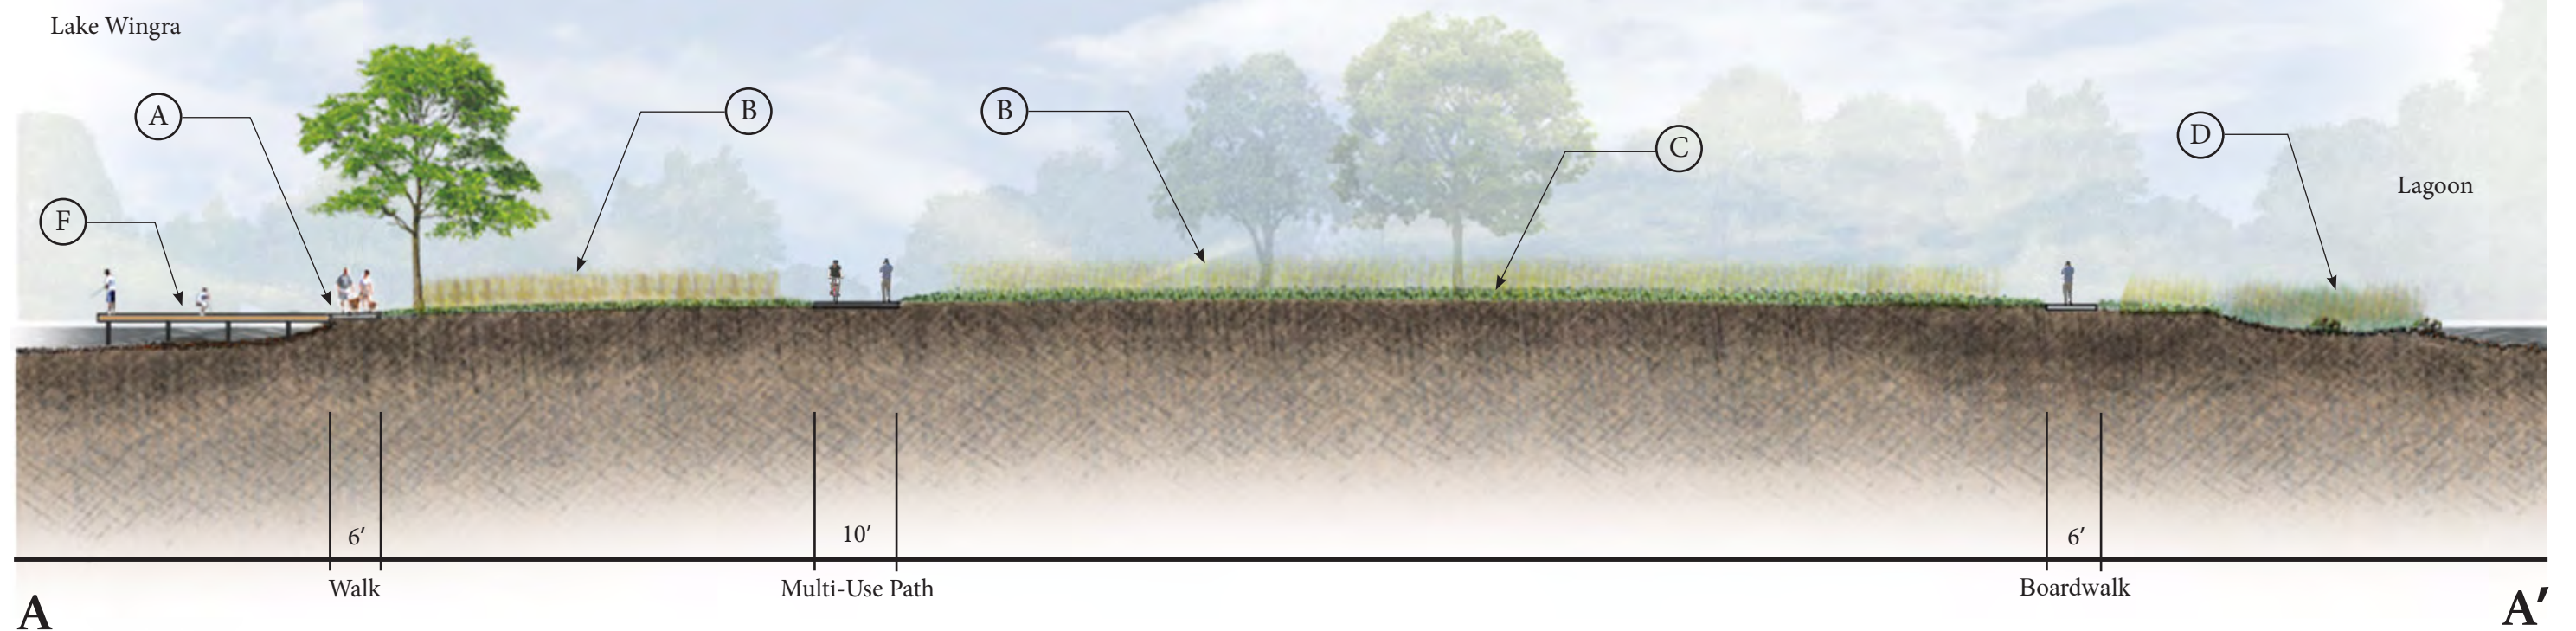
Vilas Park Drive and Peninsula Cross Section A-A' in Concept B
